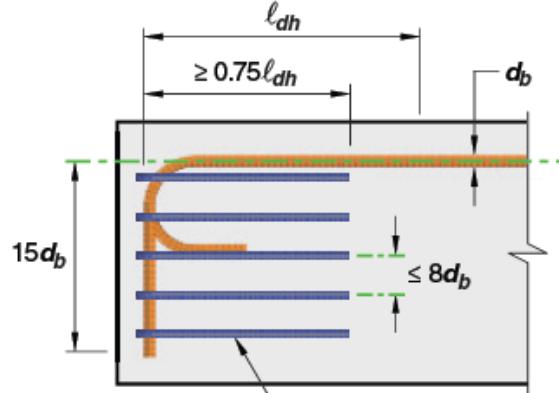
Confining reinforcement placed parallel to the bar being developed that contributes to anchorage strength of both 90- and 180-degree hooked bars.
